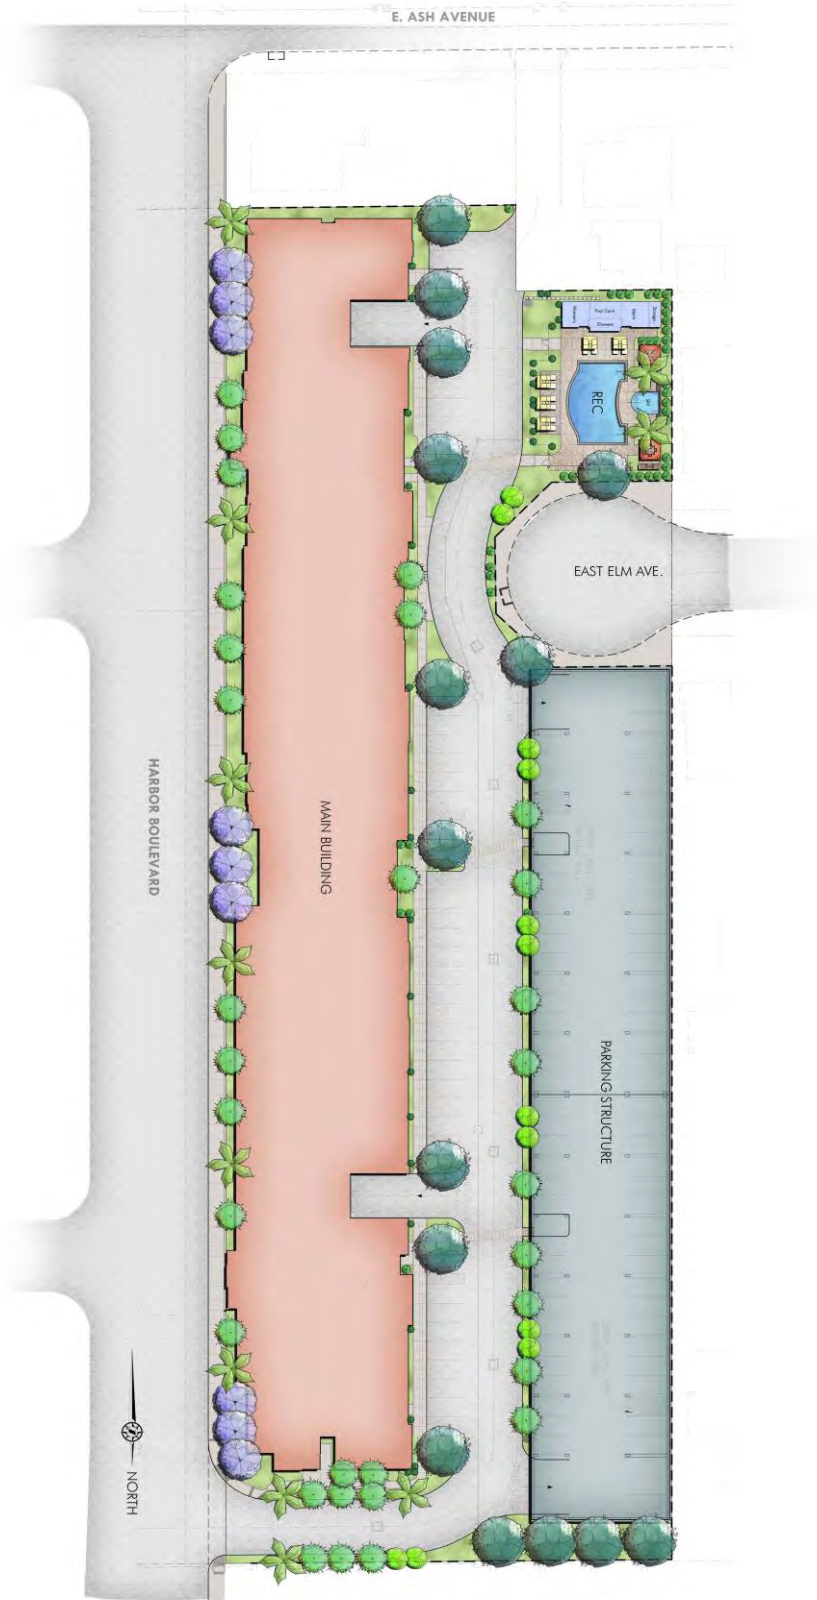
CONCEPTUAL LANDSCAPE PLAN
